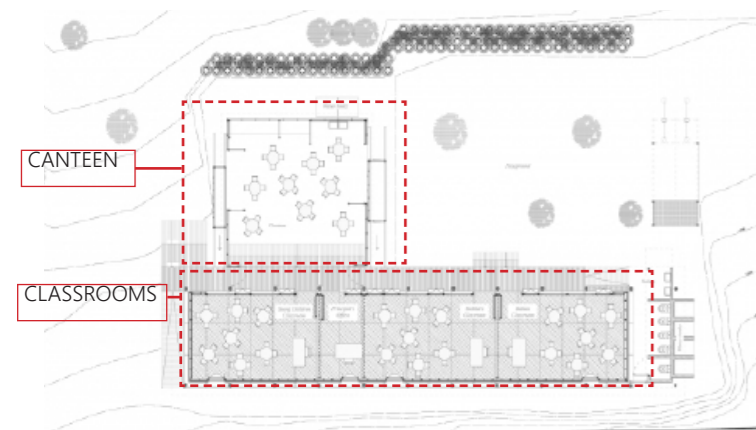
Ground floor plan drawn by Architects, and drawn over by Author,
